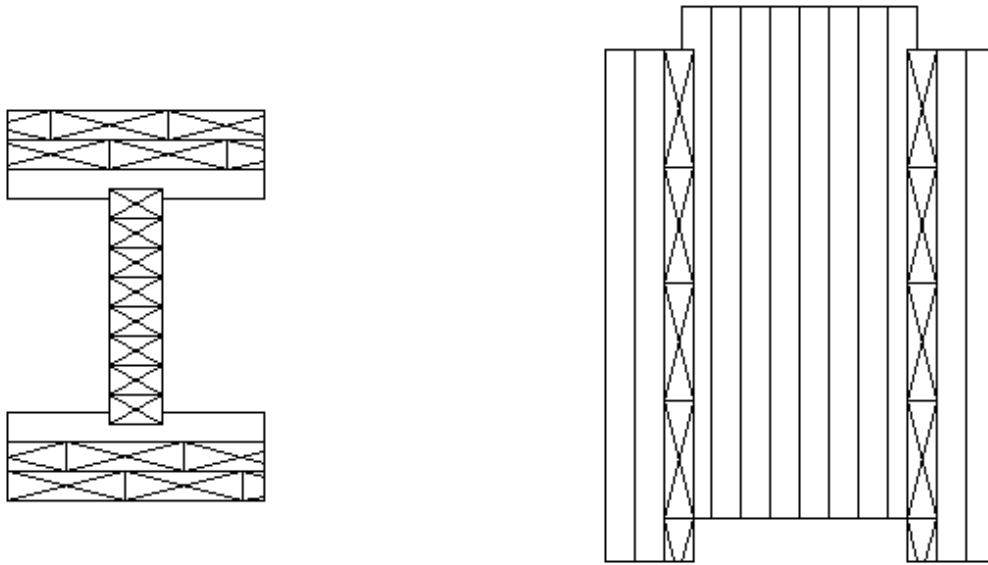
Test #9a – Glue Bond with MF in 1/2-inch Notch
